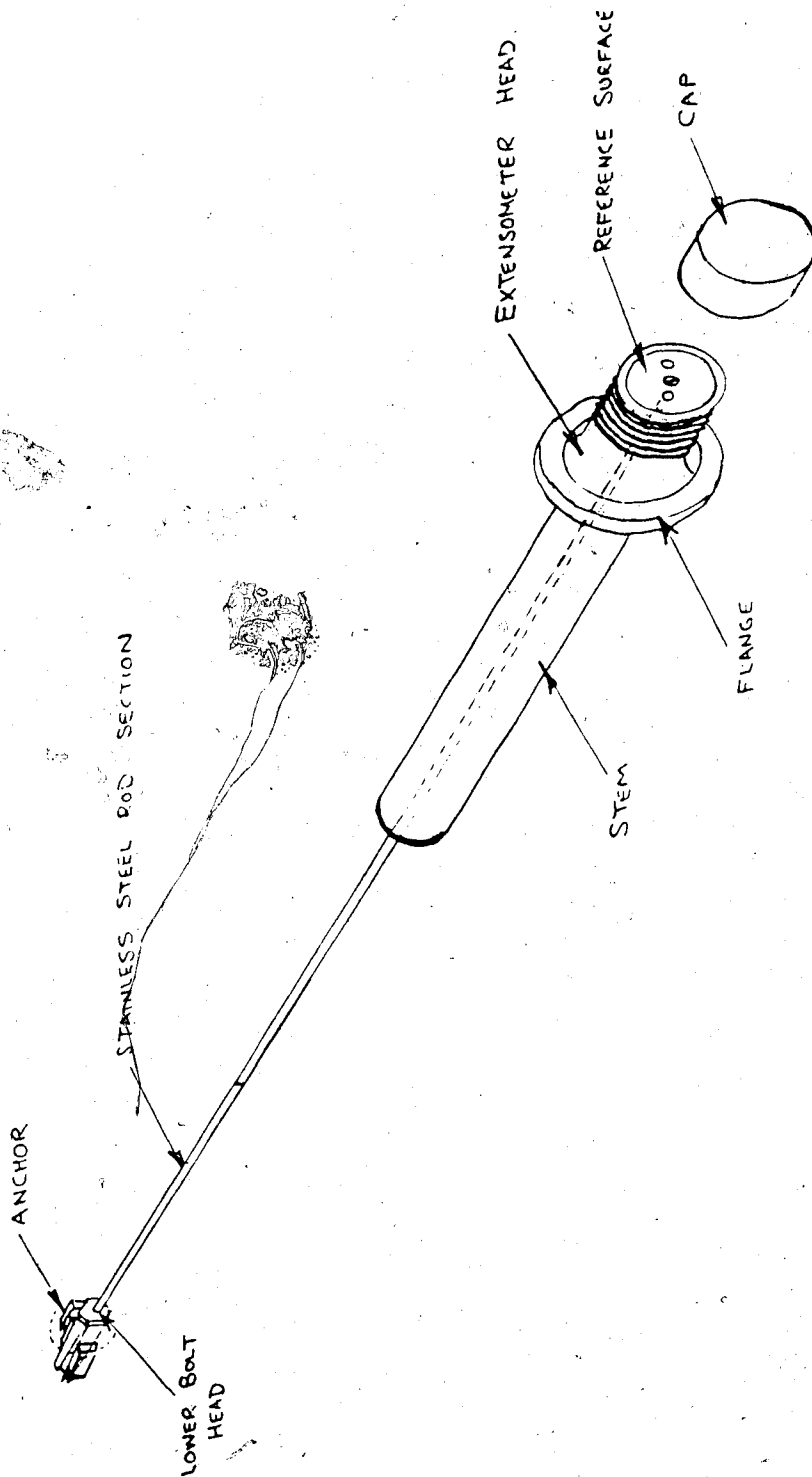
Borehole Extensometer with Single Anchor (Irad Gage Inc.)
